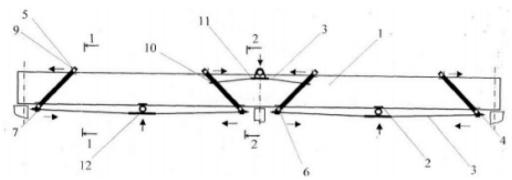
External reinforcement system of reinforced concrete continuous beams:
